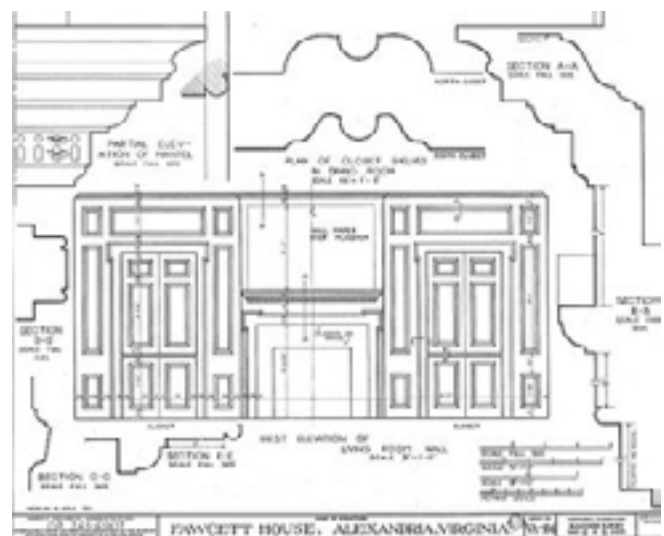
Hall mantel wall and plan of cabinet shelves, HABS drawings 1936.
